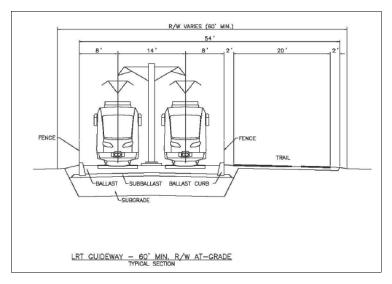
A section showing the guideway adjacent to a bike / walking trail (from the DEIS).
